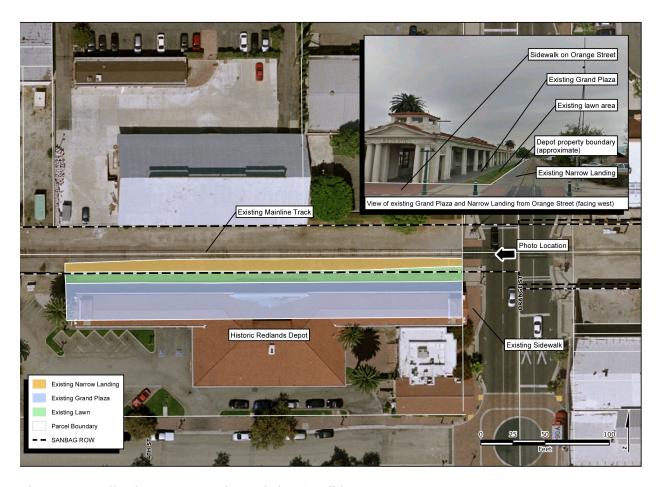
Redlands Santa Fe Station Existing Conditions.
